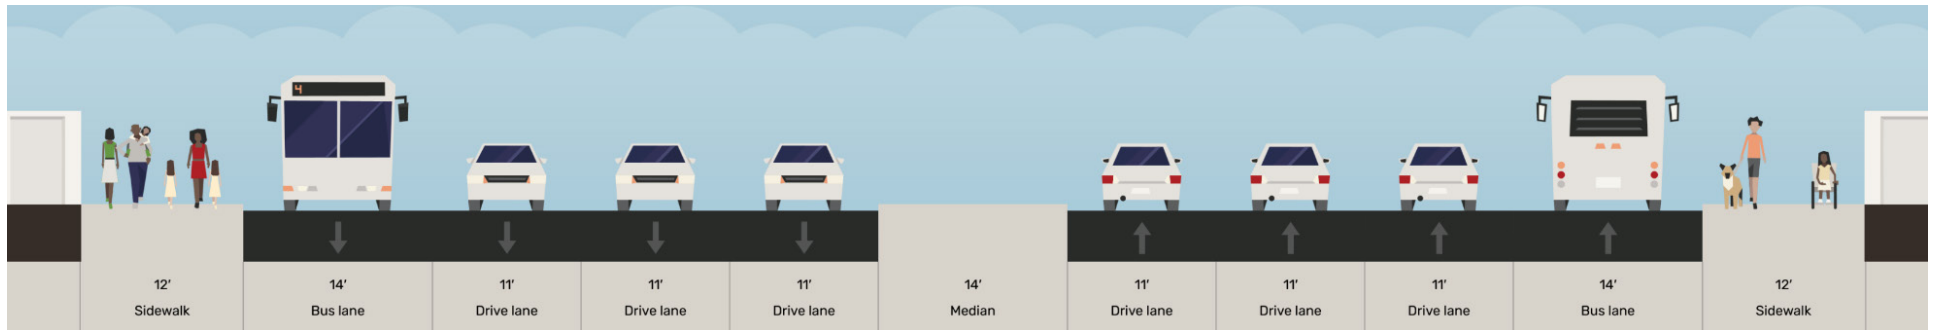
Existing cross-section: Crenshaw Blvd from W 118th Pl to I-105 eastbound on-ramp (at I-105 Underpass)
